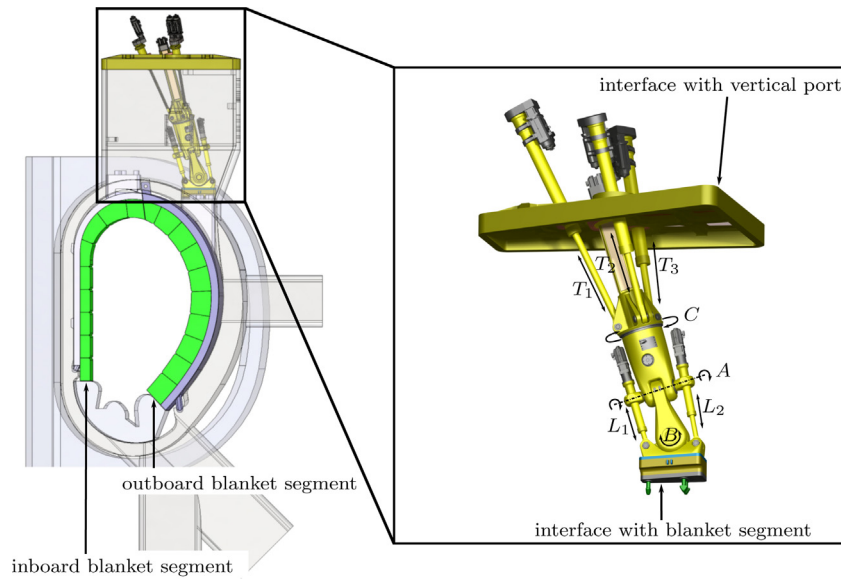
Hybrid kinematic mechanism for EU DEMO blanket remote handling.
